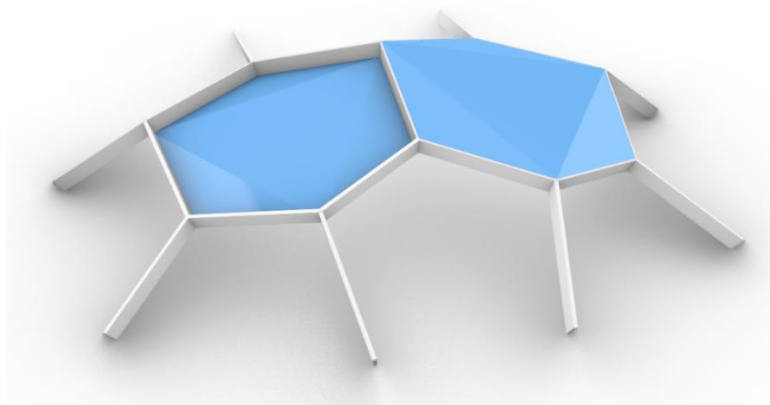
With edge offset, panels can be located on top and bottom of beams of constant section
